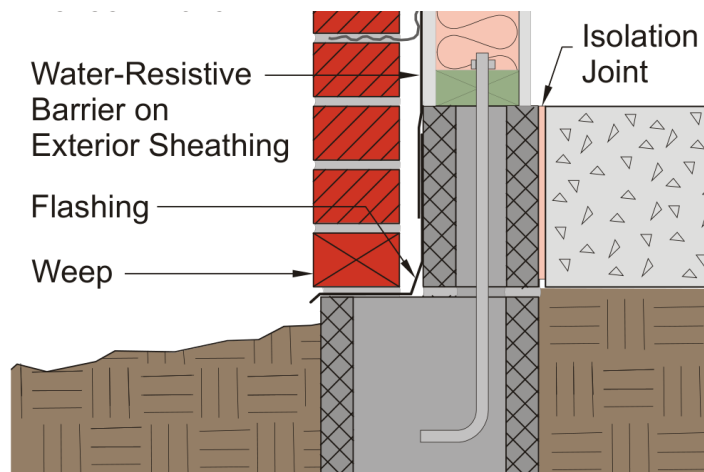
CMU foundation with slab on grade, using an isolation joint to absorb differential movement between the veneer and the slab.
